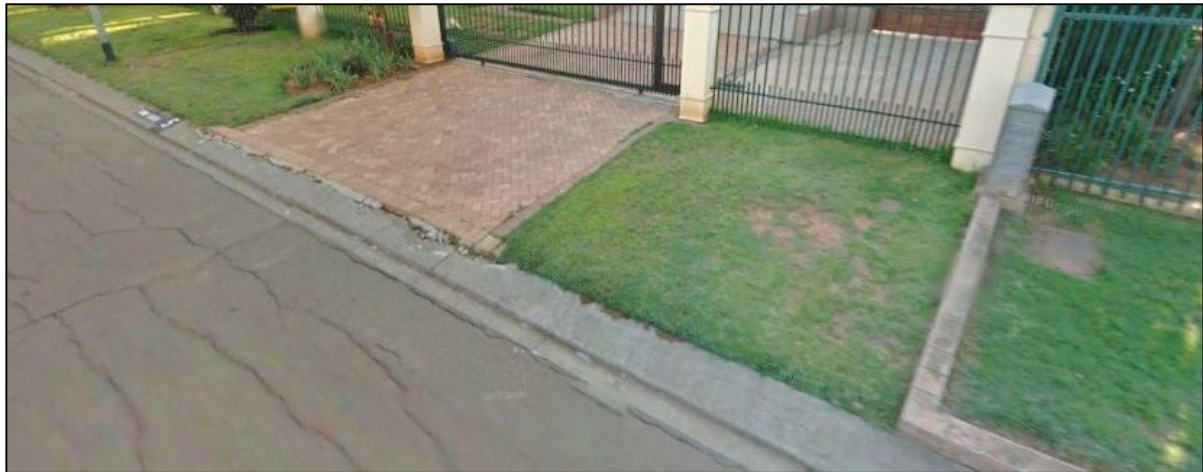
Sidewalk location 5; Tommy Border Street, Universitas (Source: Author).
